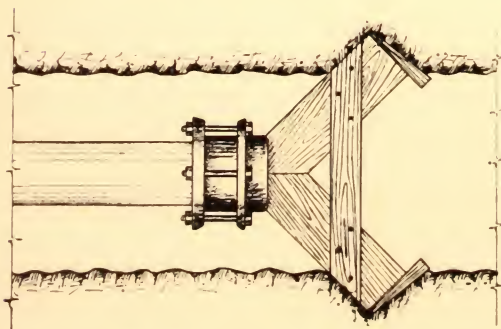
METHOD OF BUTTRESSING AN END CAP DURING PRESSURE TESTS
